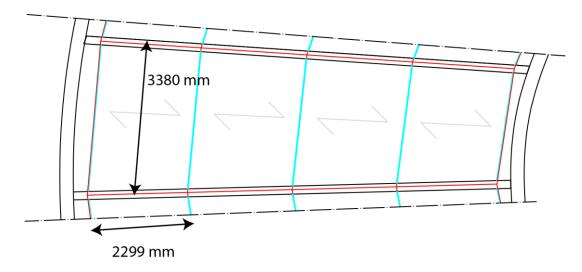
Section of the glass roof panels. The panels span from glass support beam to beam. Source: own ill.
